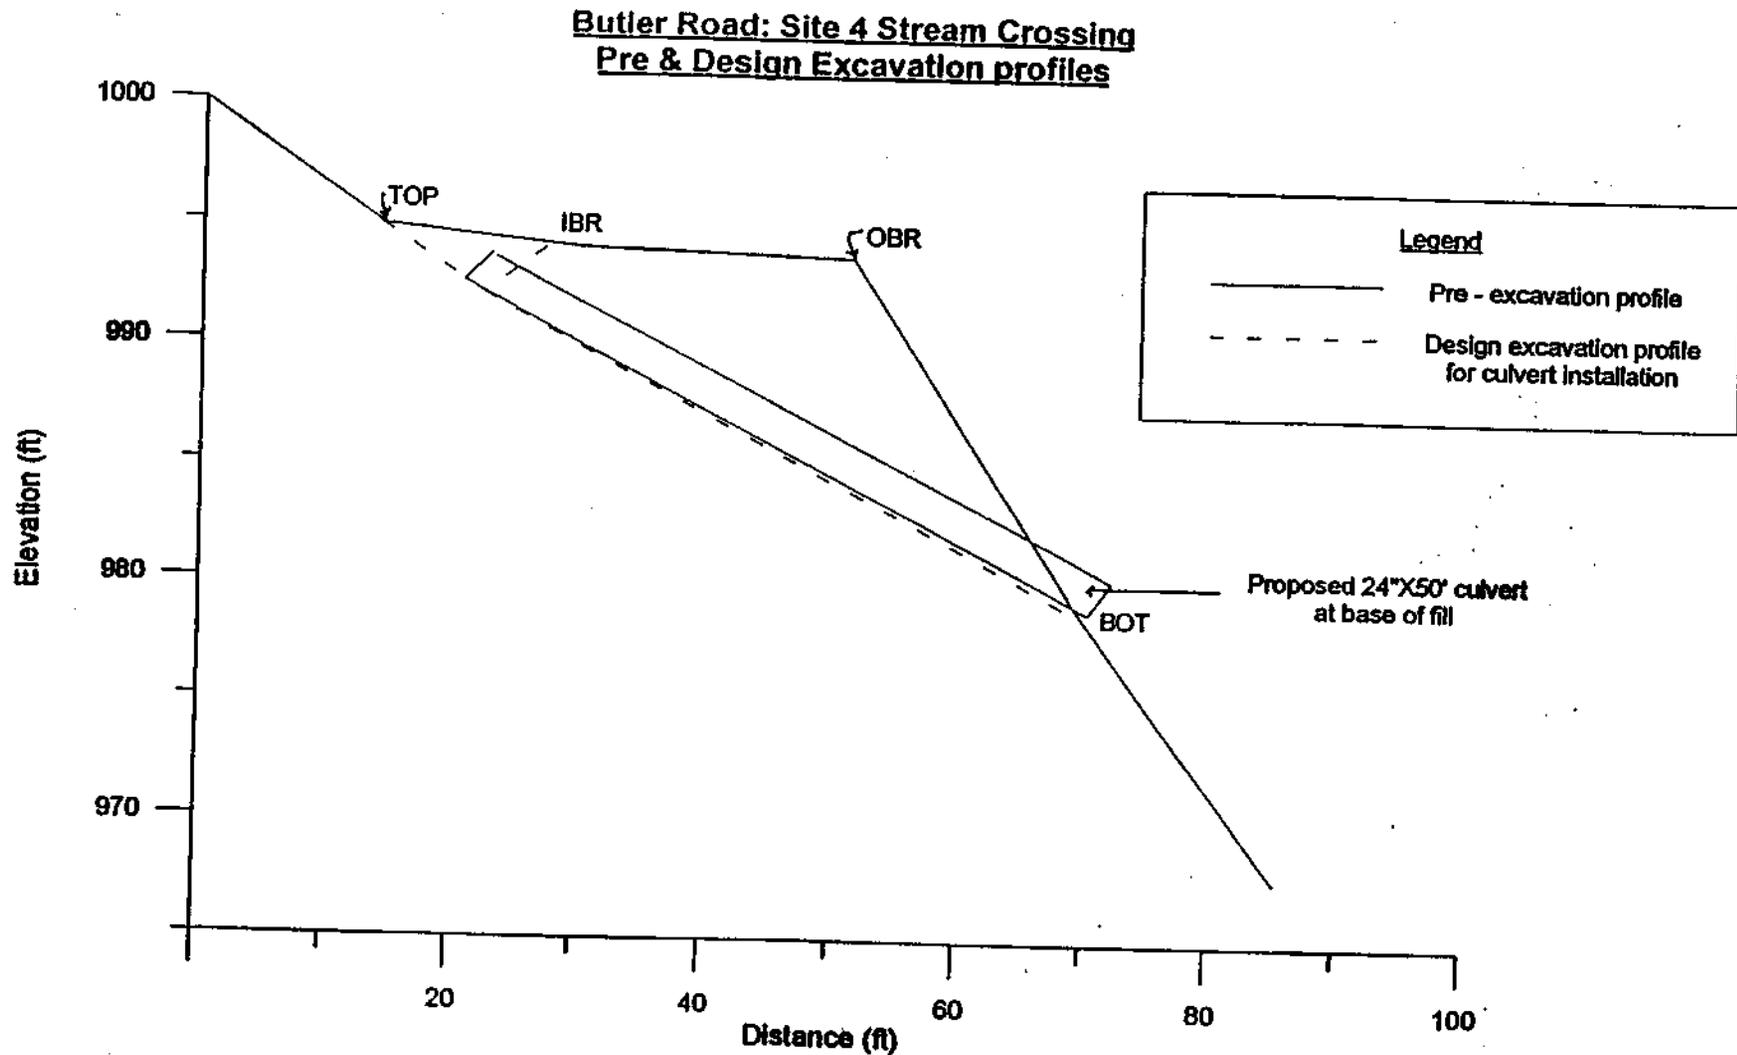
Butler Road: Site 4 Stream Crossing Pre & Design Excavation Profiles.
